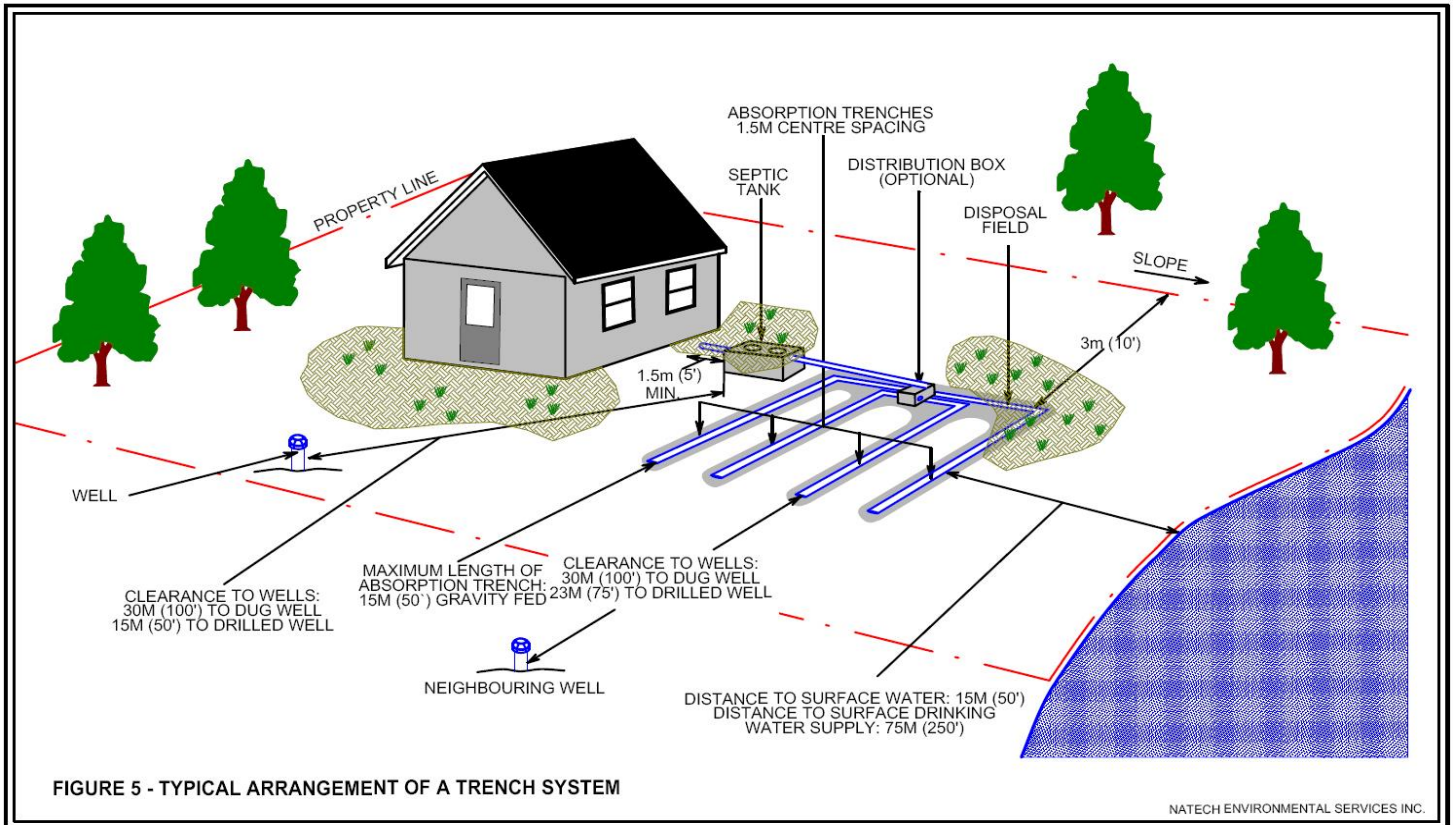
TYPICAL ARRANGEMENT OF A TRENCH SYSTEM
